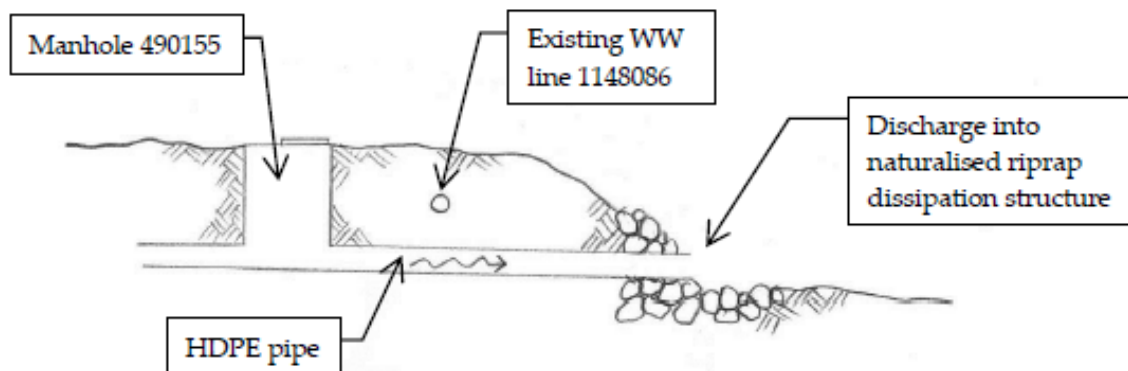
Recommended option to daylight the piped section downstream of the wastewater pipe crossing
